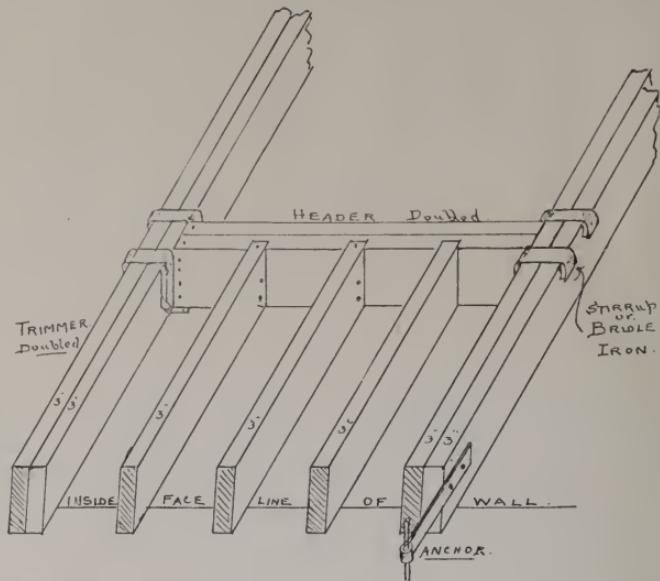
HEADERS AND TRIMMERS DOUBLED, ALSO FRAMING OF FLOOR BEAMS.
